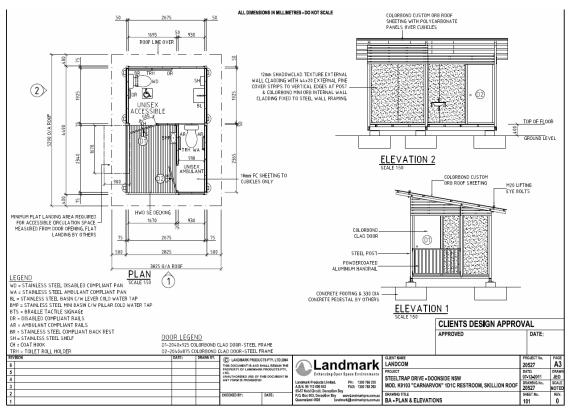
Typical floor plan and elevations of Landmark Carnarvon
